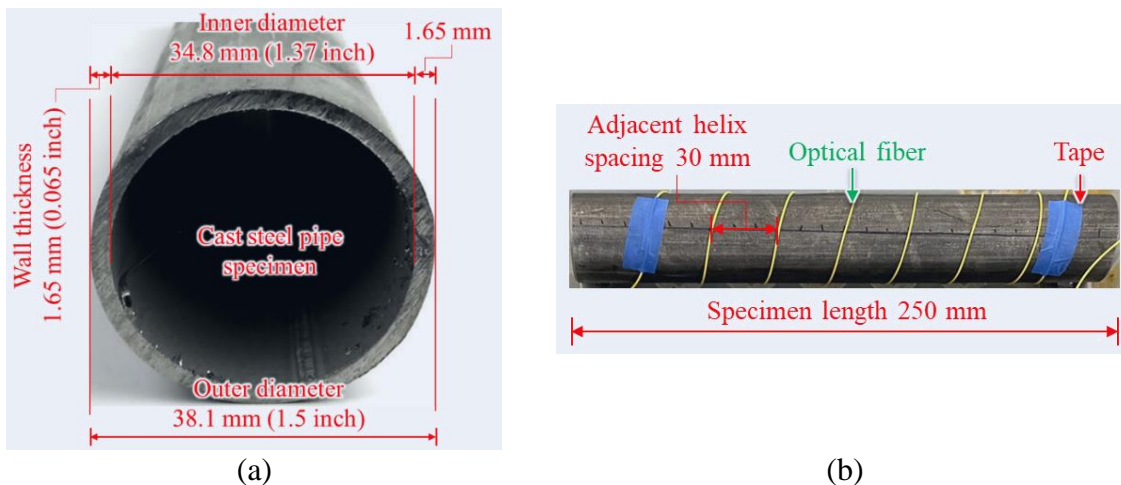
Dimensions of pipe specimen and installation of fiber optic cable: (a) dimensions of the pipe; and (b) installation of fiber optic cable on the pipe.
